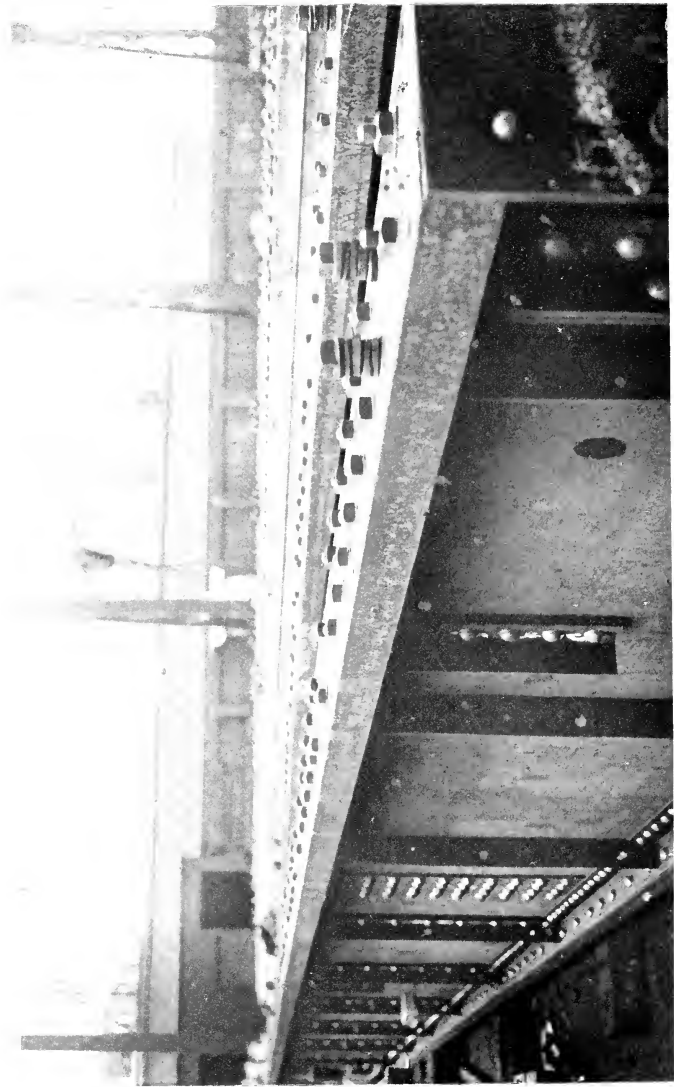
BOYLSTON STREET BRIDGE TYPICAL FLOOR BEAM FOR NEW CITY BRIDGE BEFORE CONCRETING
